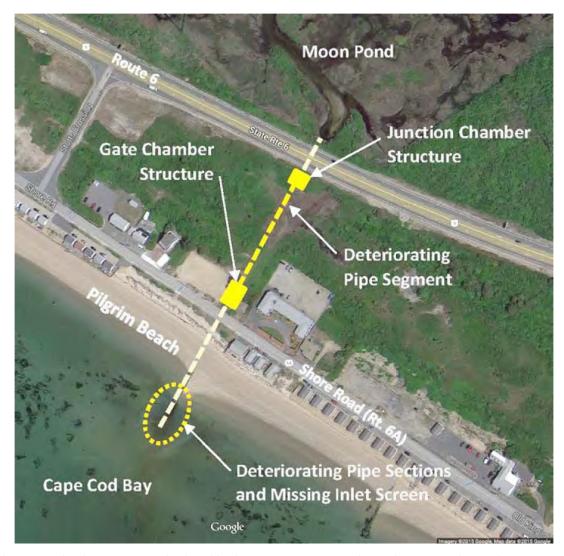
Aerial image of the deteriorating and vulnerable characterists of East Harbor Culvert. From the Final Report: East Harbor Culvert Evaluation (Woods Hole Group, 2015)
